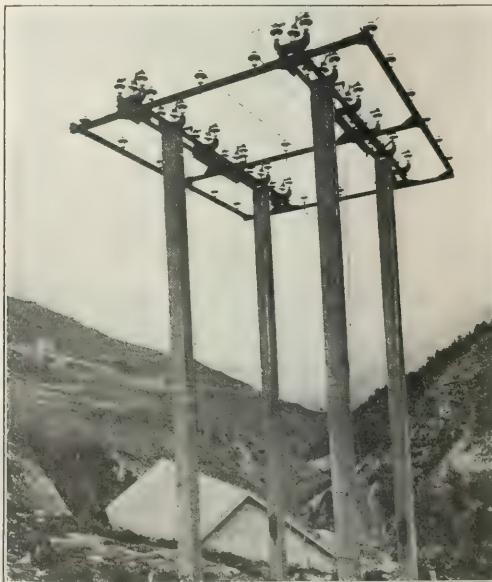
CONCRETE POLES AT SECTION POINT ON LINE
